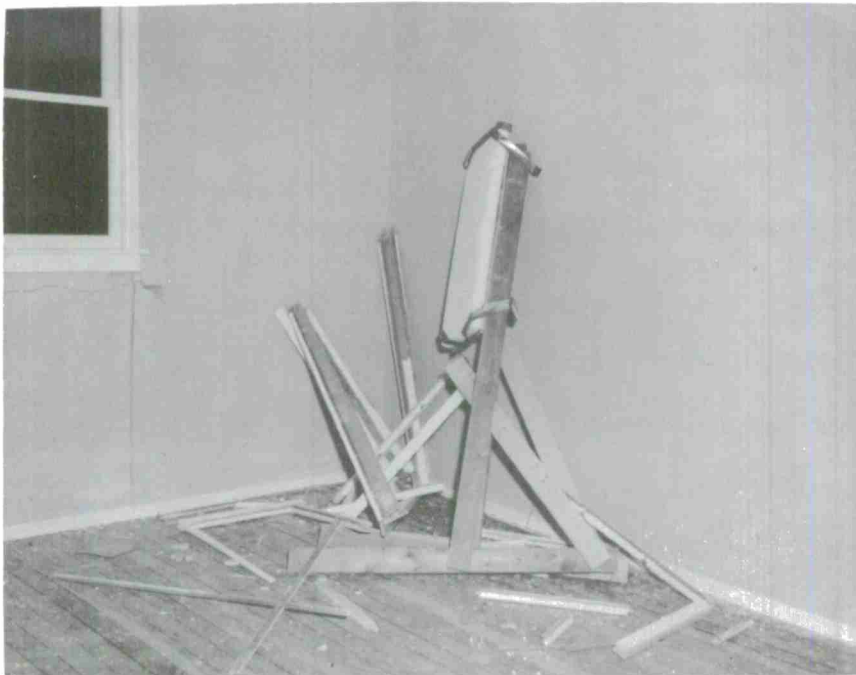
Posttest Northwest Corner, Master Bedroom, Showing Window From South Wall and Glass Trap
